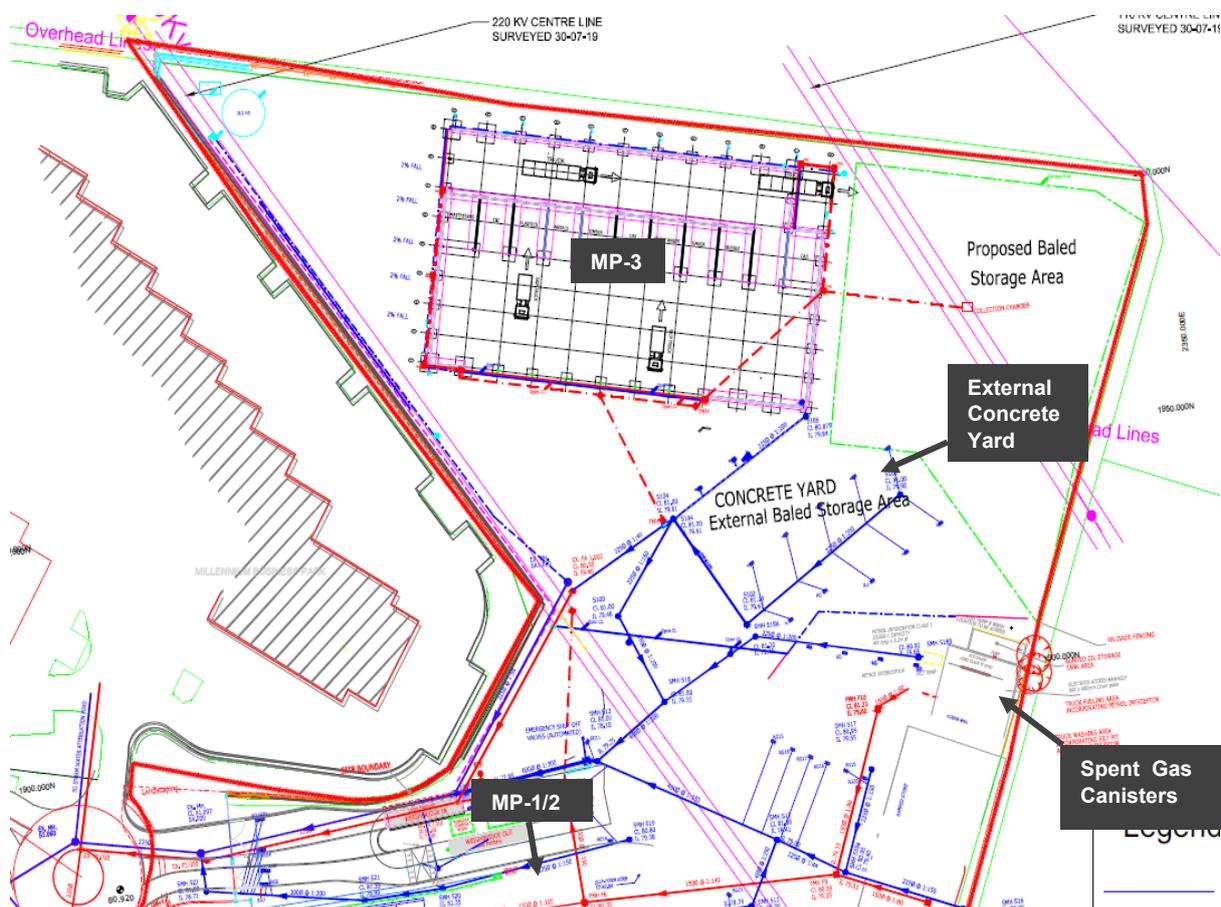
Site Layout – MP-3: Bulky Waste & Skip Waste Processing & External Concrete Yard (OCM, 2021)
